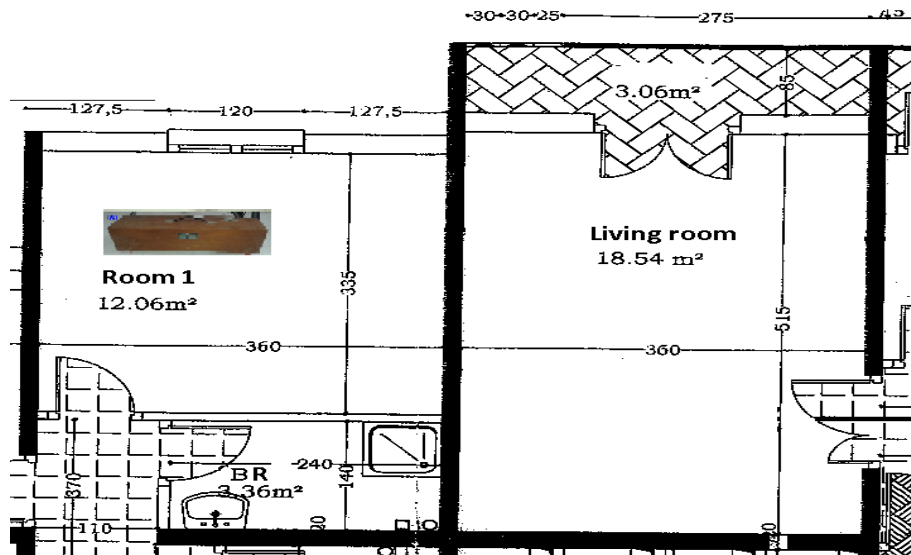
Detailed plan configuration of the apartments under experiment [11]
